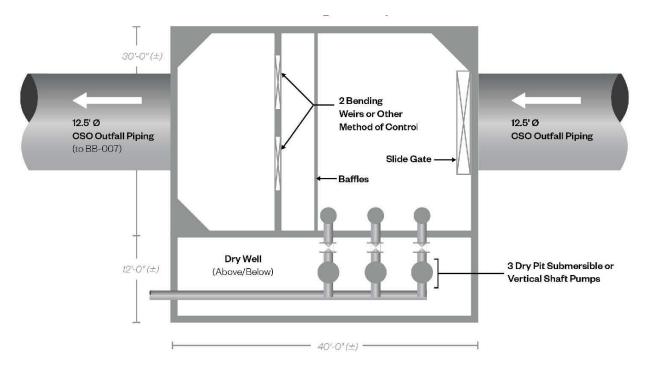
Layout of Alternative 9-3 – Outfall Storage Pumping Station for BB-008
